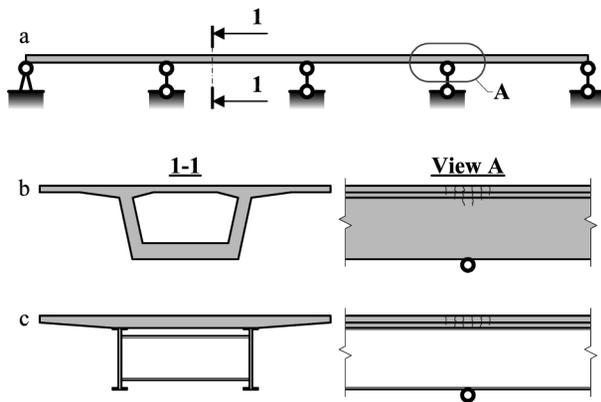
Sketch of a continuous bridge (a); cracking pattern of concrete (b) and composite (c) sections
